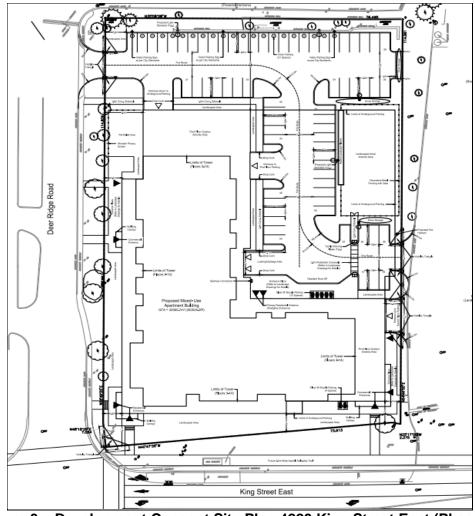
Development Concept Site Plan 4220 King Street East (Phase 2)
